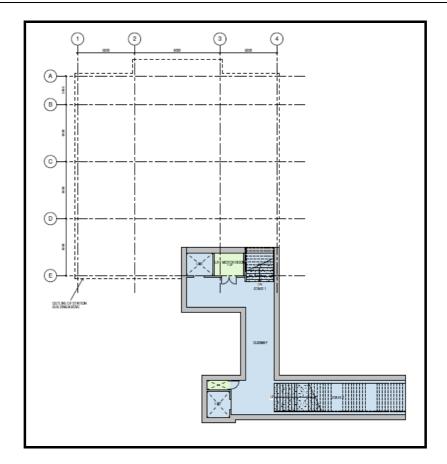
Western Entrance, Proposed Floor Plans – Pedestrian 'subway' level
